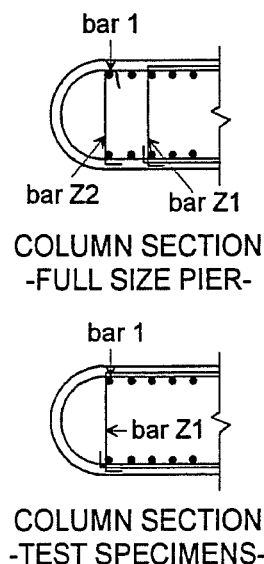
Relocation of Bars Z1 in the Test Specimens
